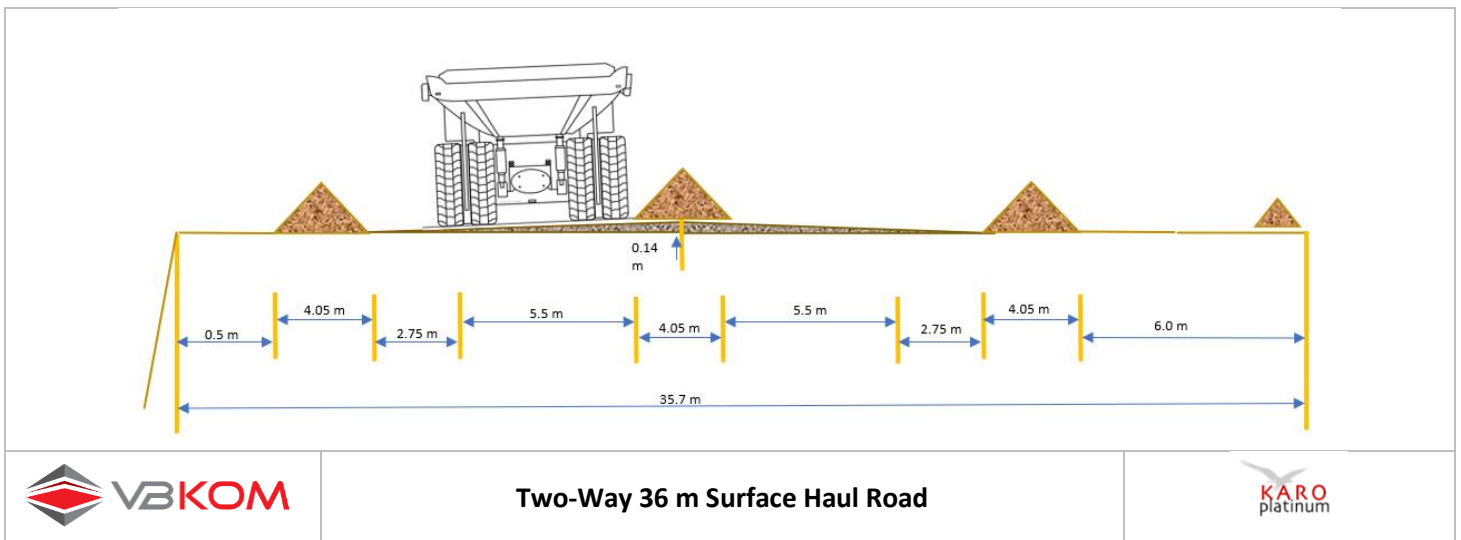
Two-way 36 m surface haul road (source: Haul Road Design\_Options.xlsx).
